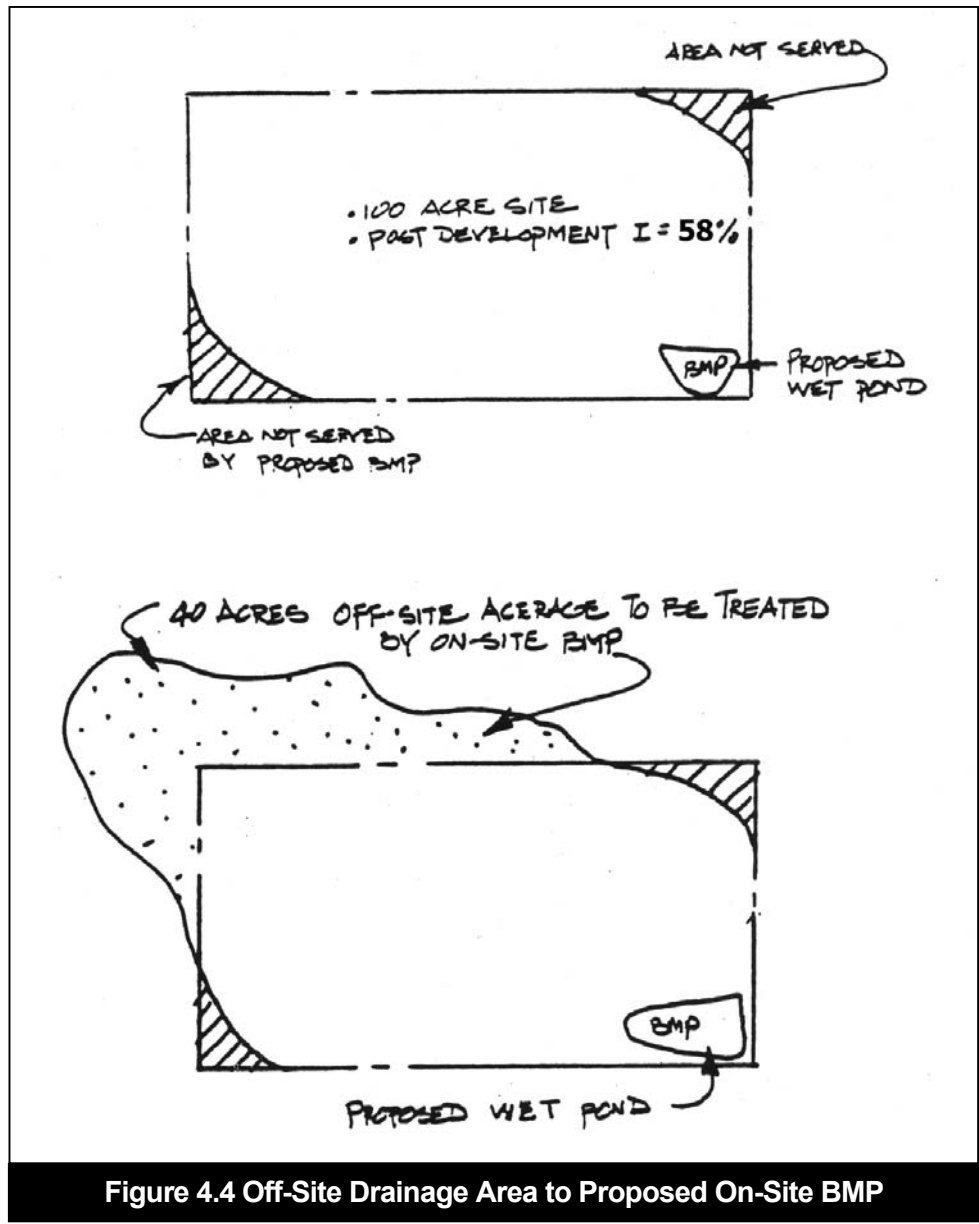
Off-Site Drainage Area to Proposed On-Site BMP
